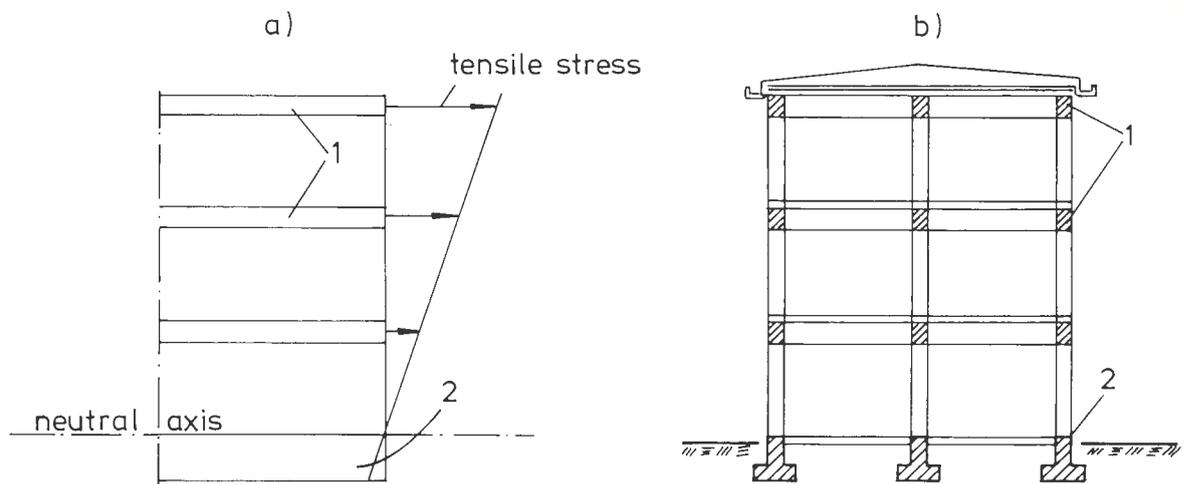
a) simplified assumptions; b) cross section of the building; 1) longitudinal bands, 2) strip footing.
